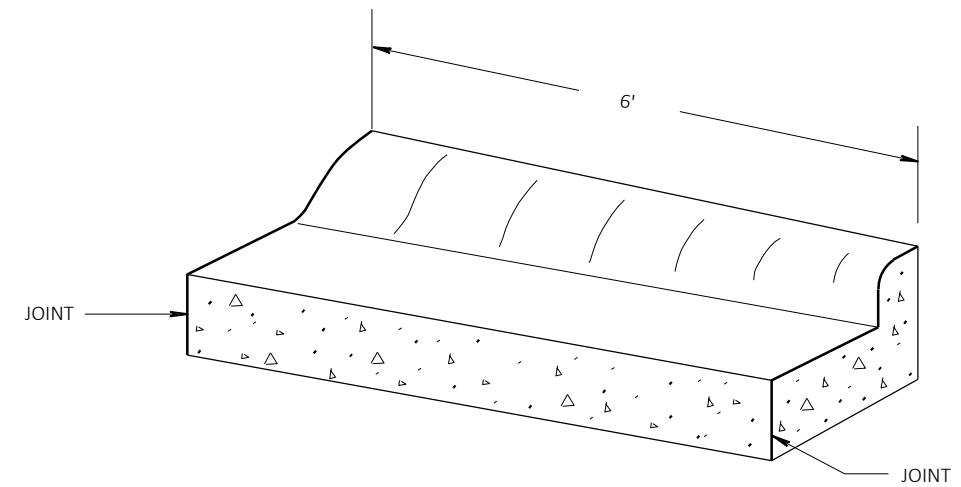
DETAIL OF CONCRETE CURB & GUTTER 30-INCH TYPE A AT INLETS
